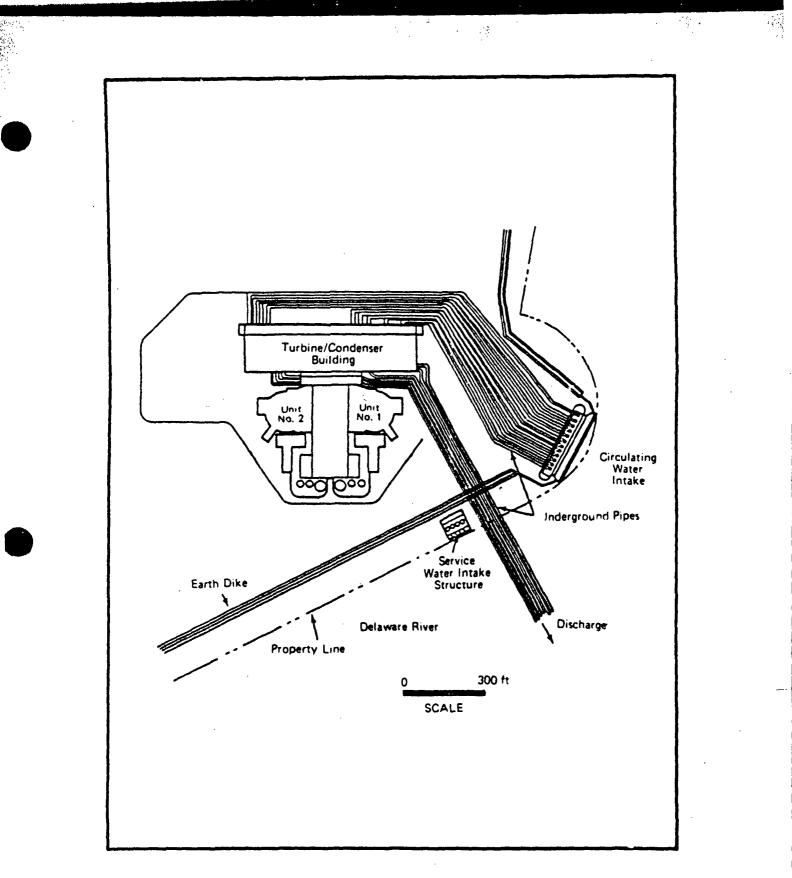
Salem Generating Station Layout with Cooling Water Piping Arrangement
